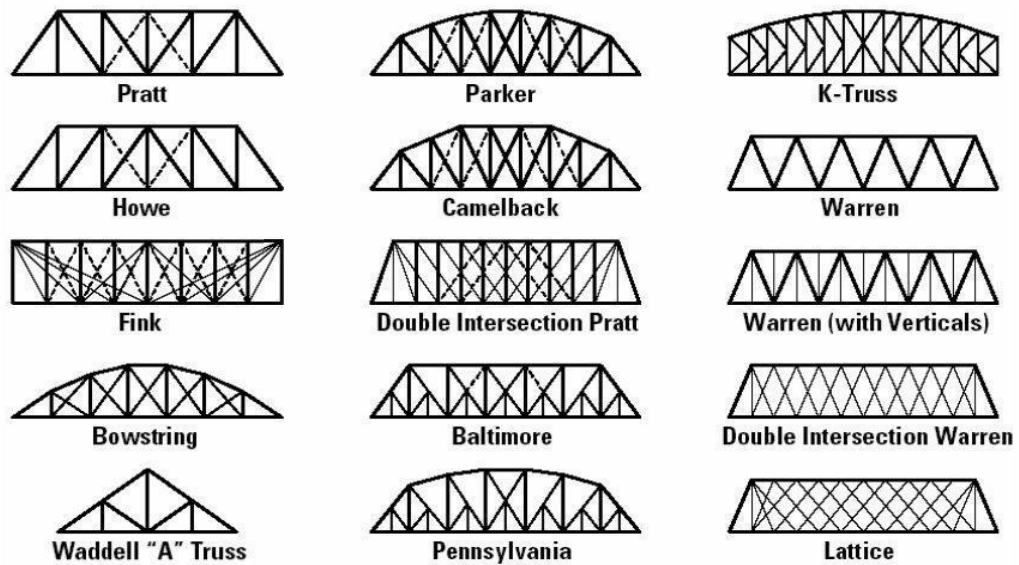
Different truss types used for the bridges (Miss, n.d.)
